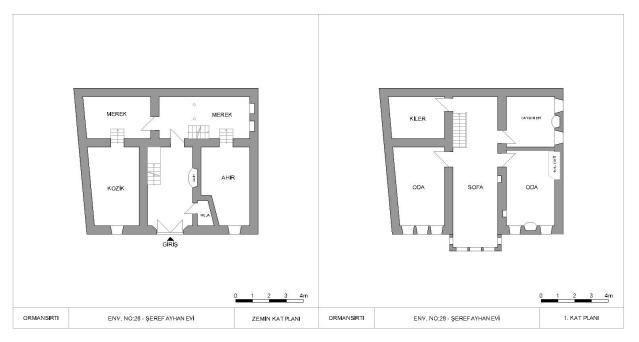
Plan Scheme of Şeref Ayhan House (Ormansırtı Village).
